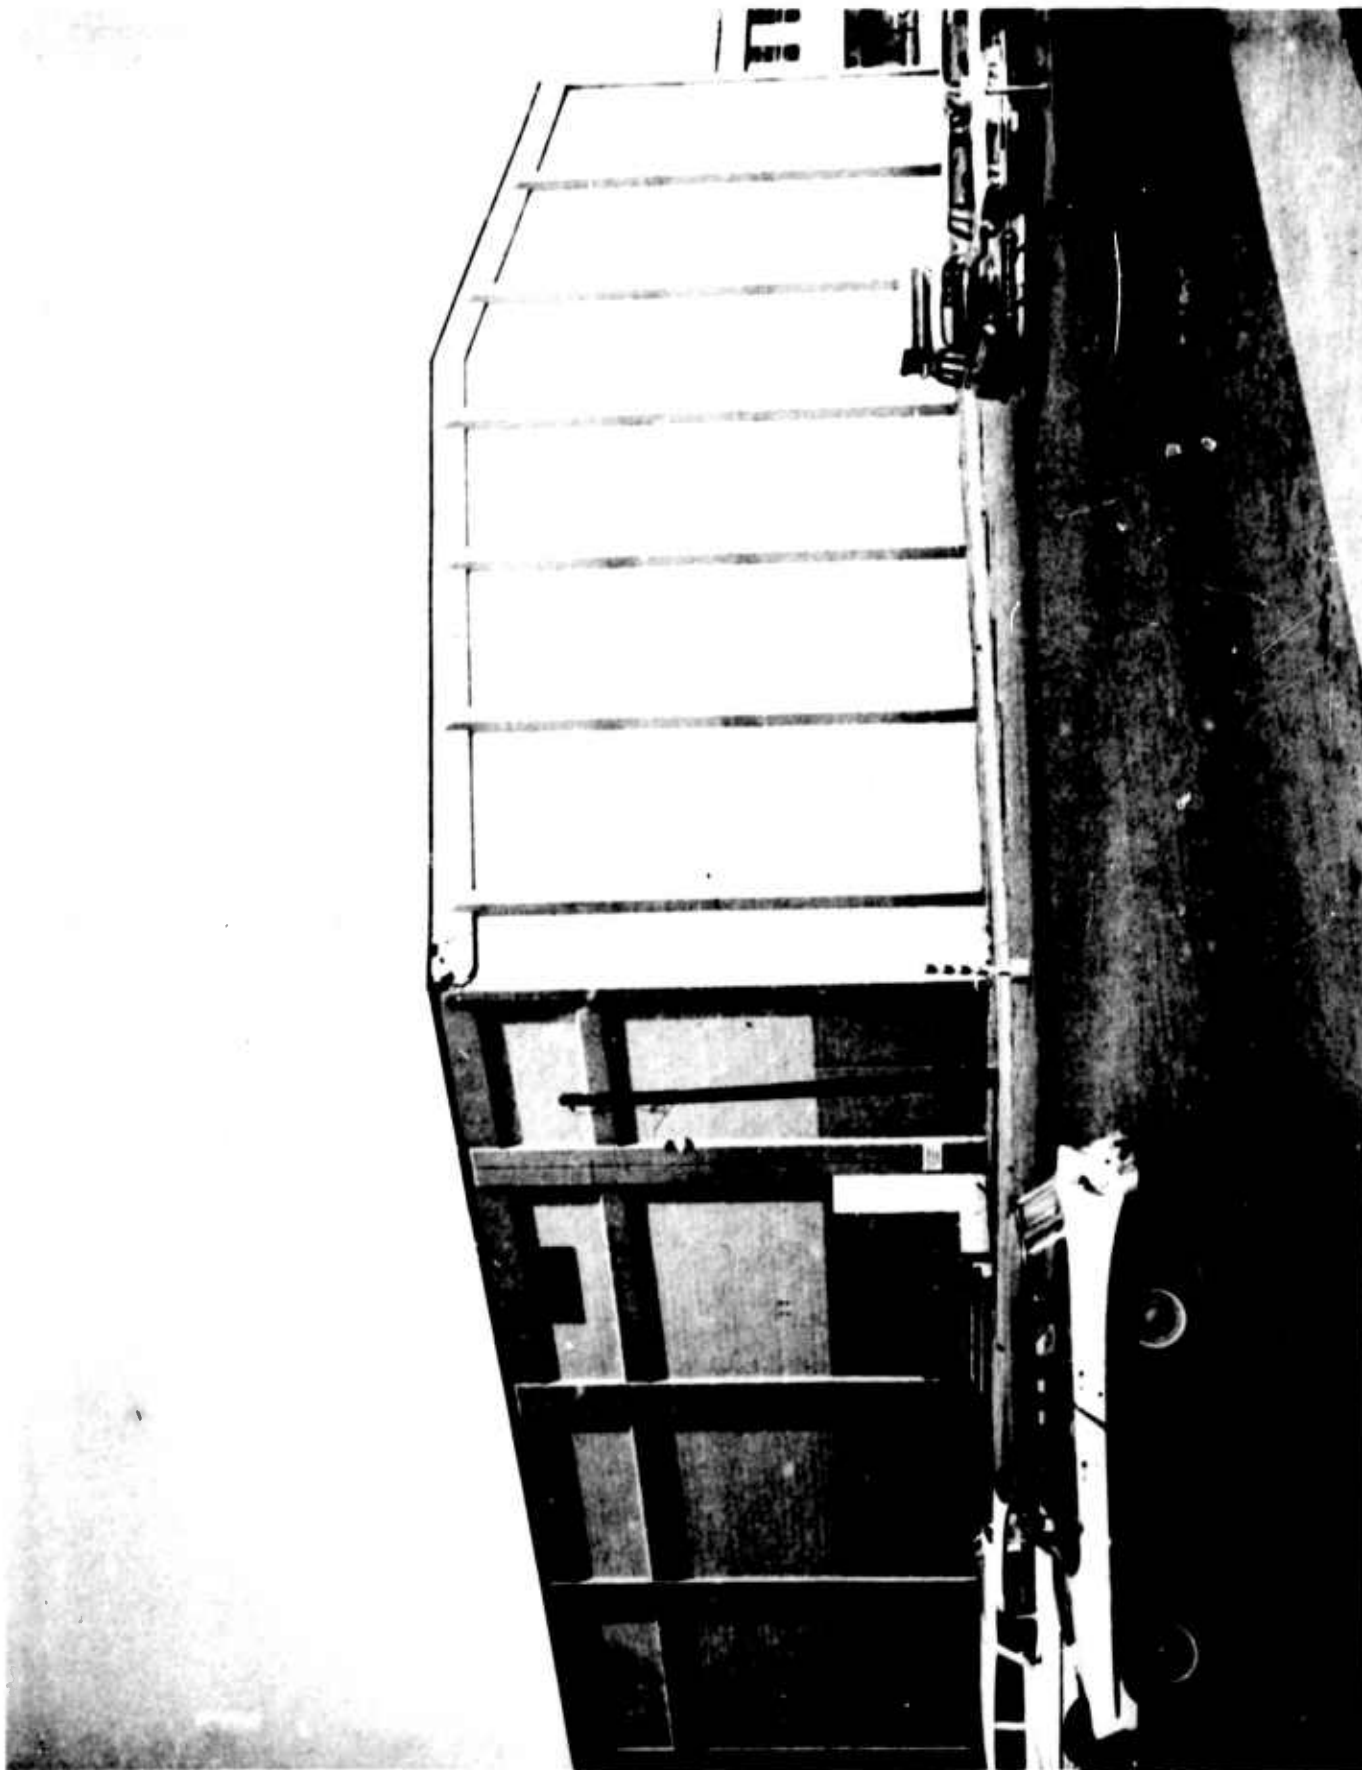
Elmendorf AFB Field House (Southwest corner of structure)
